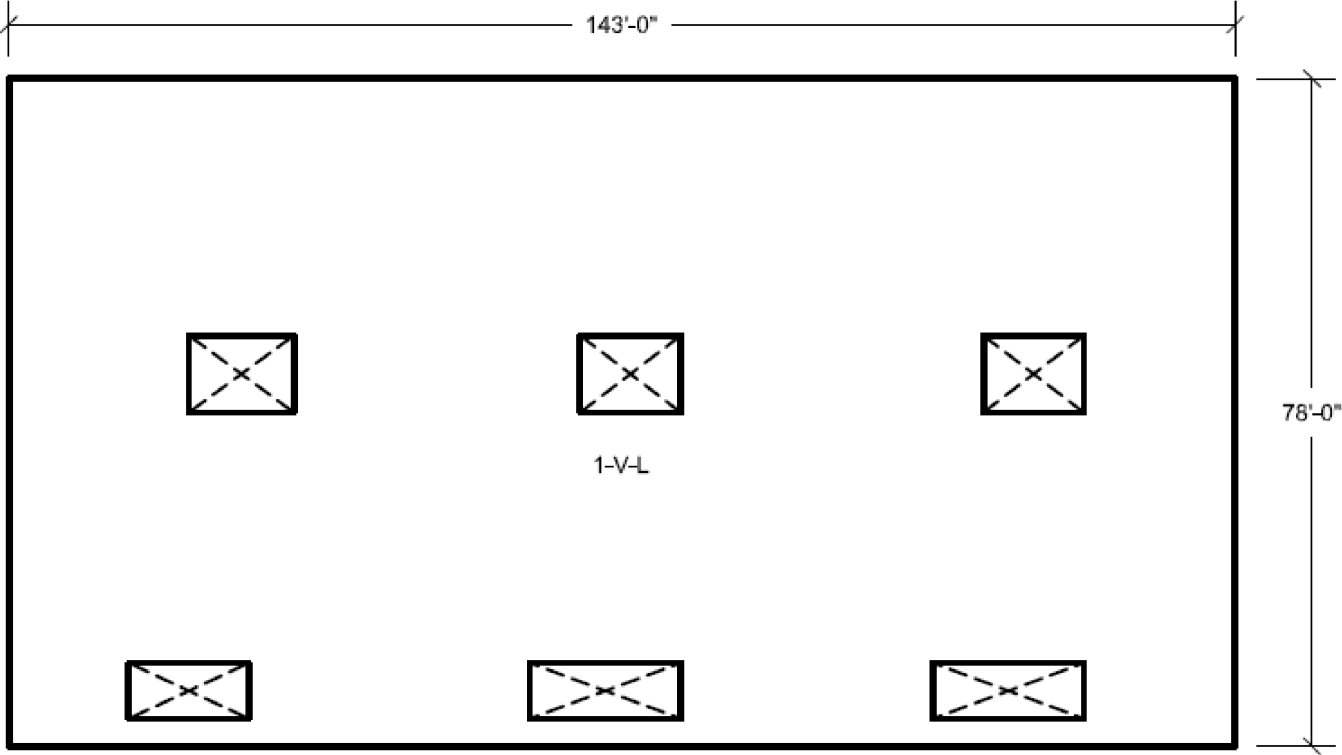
H.6-128 Pump House Floor El 15'-2" North/South Reinforcement Zones Top Face
